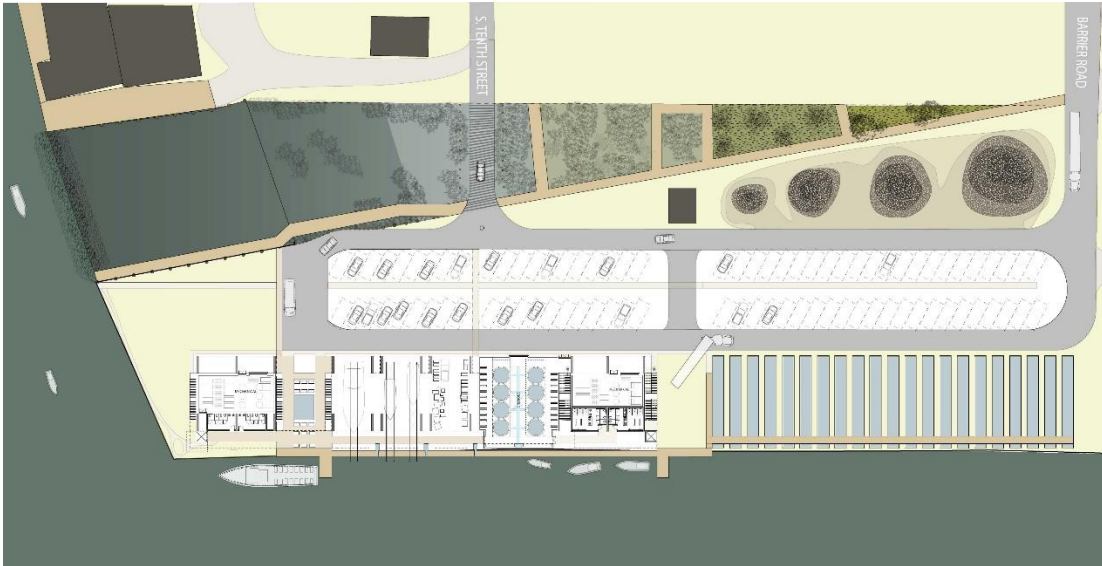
Ground Floor Plan and Bioretention System. Image by Author.
